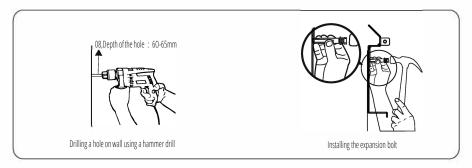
Drilling a hole and installing expansion bolts (unit: mm)
